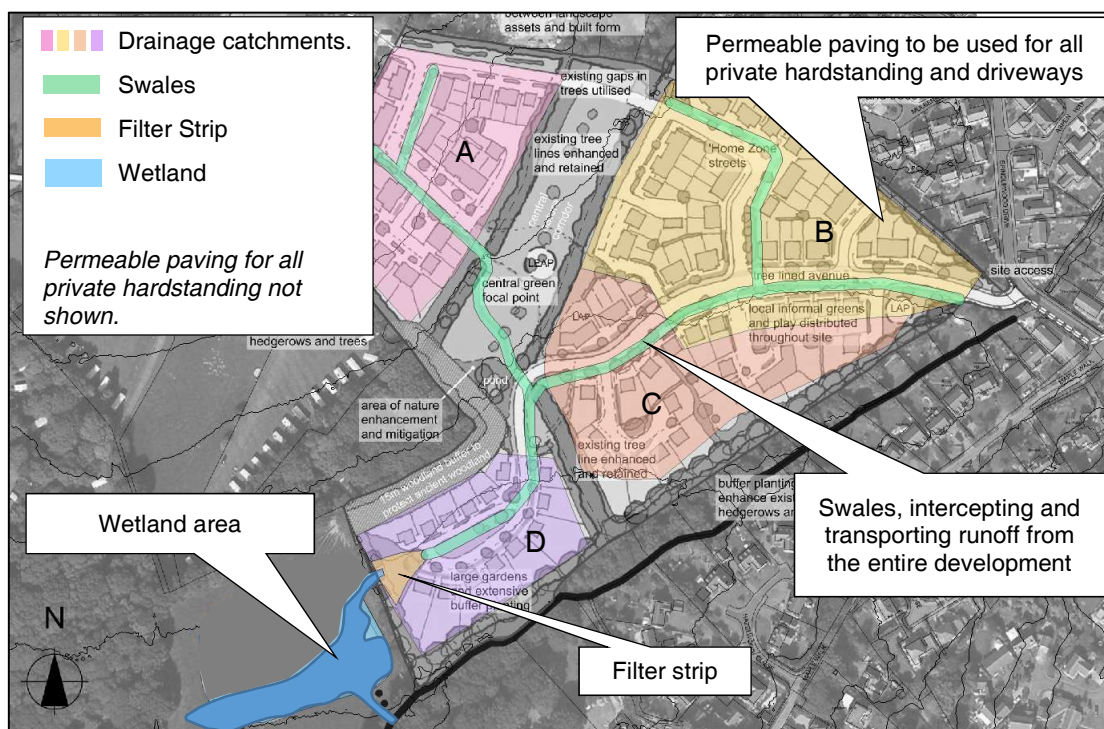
Indicative drainage layout plan showing the proposed SuDS and revised wetland extent, following natural the natural topography.
